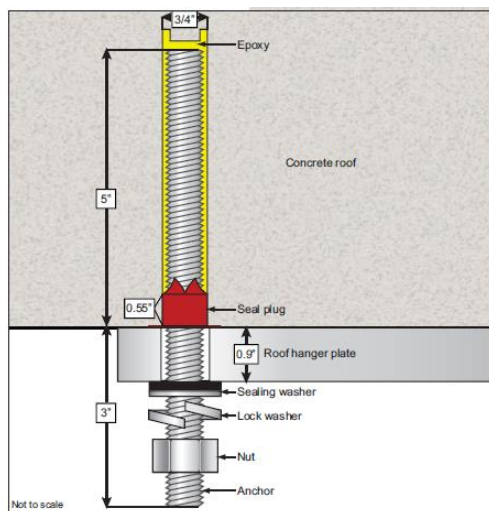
Adhesive anchor and roof hanger plate assembly (National Transport Safety Board, 2007, p. 9)
